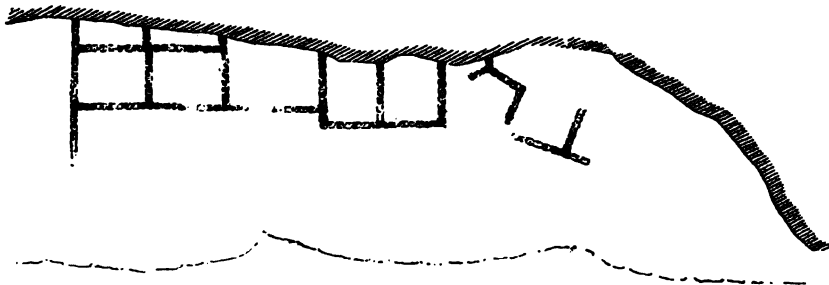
Plan of a large cliff outlook in Canyon del Muerto.
